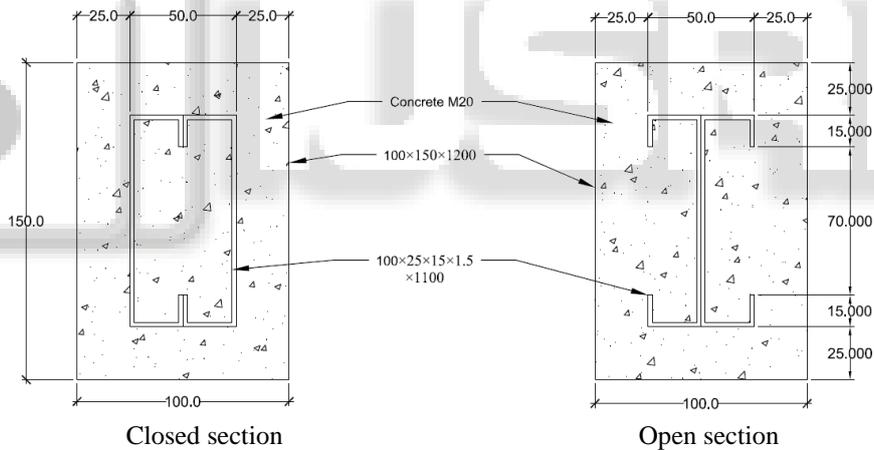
Typical cross sectional details of beam specimens (all dimensions are in mm)
